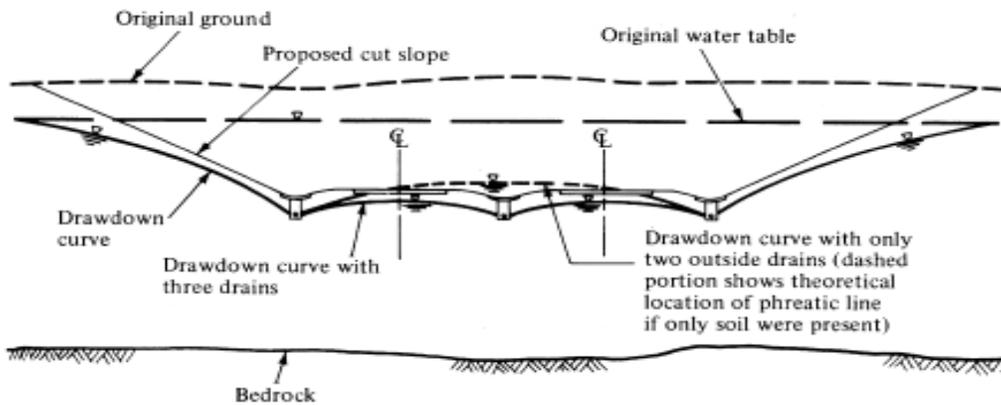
Multiple Longitudinal Drawdown Drain Installation
